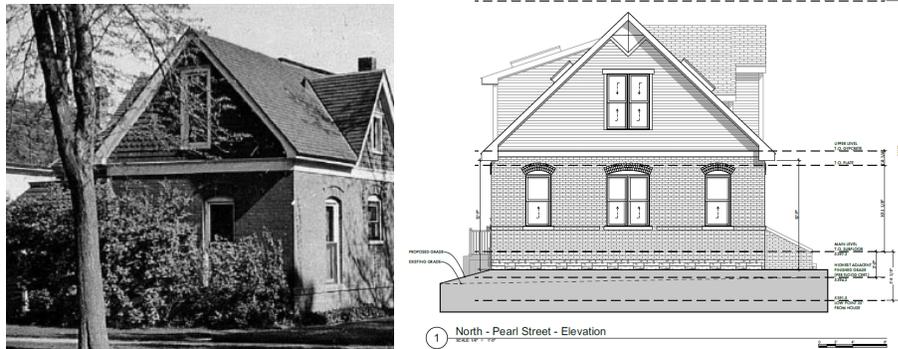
Detail of 1949 Photo of house (left) Proposed North (Pearl Street) Elevation (right).
